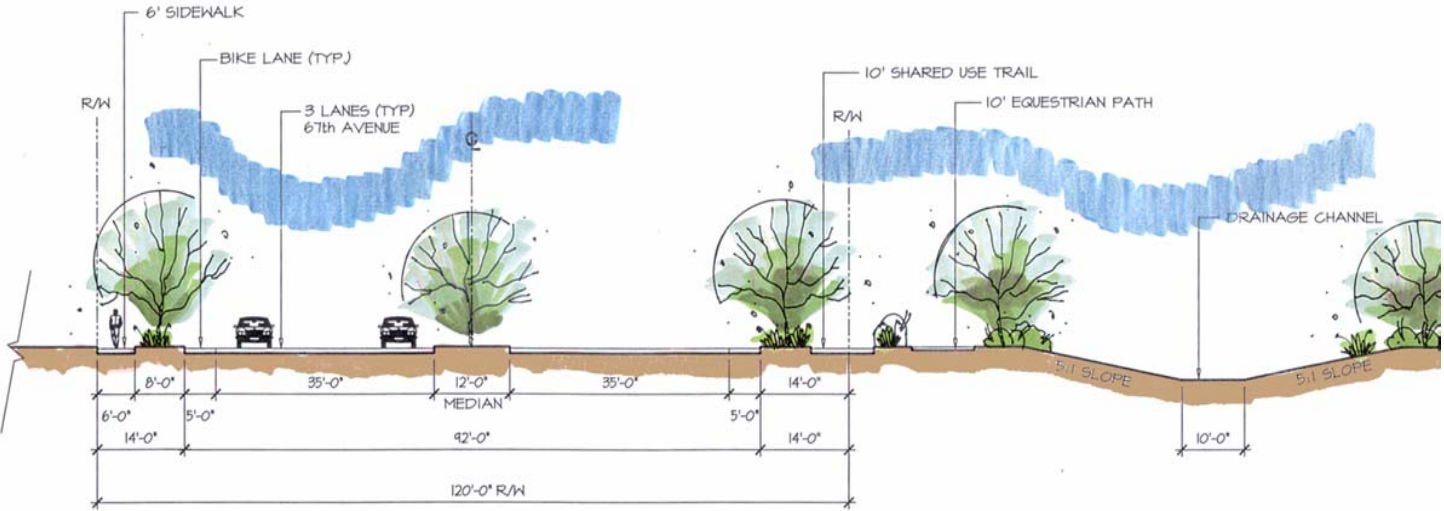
67<sup>th</sup> Avenue Channel Cross-section
